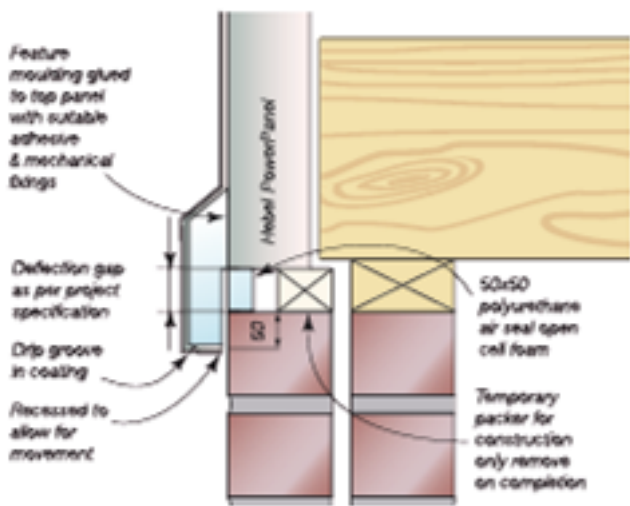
Typical Horizontal Control Joint - Timber Stud Frame
